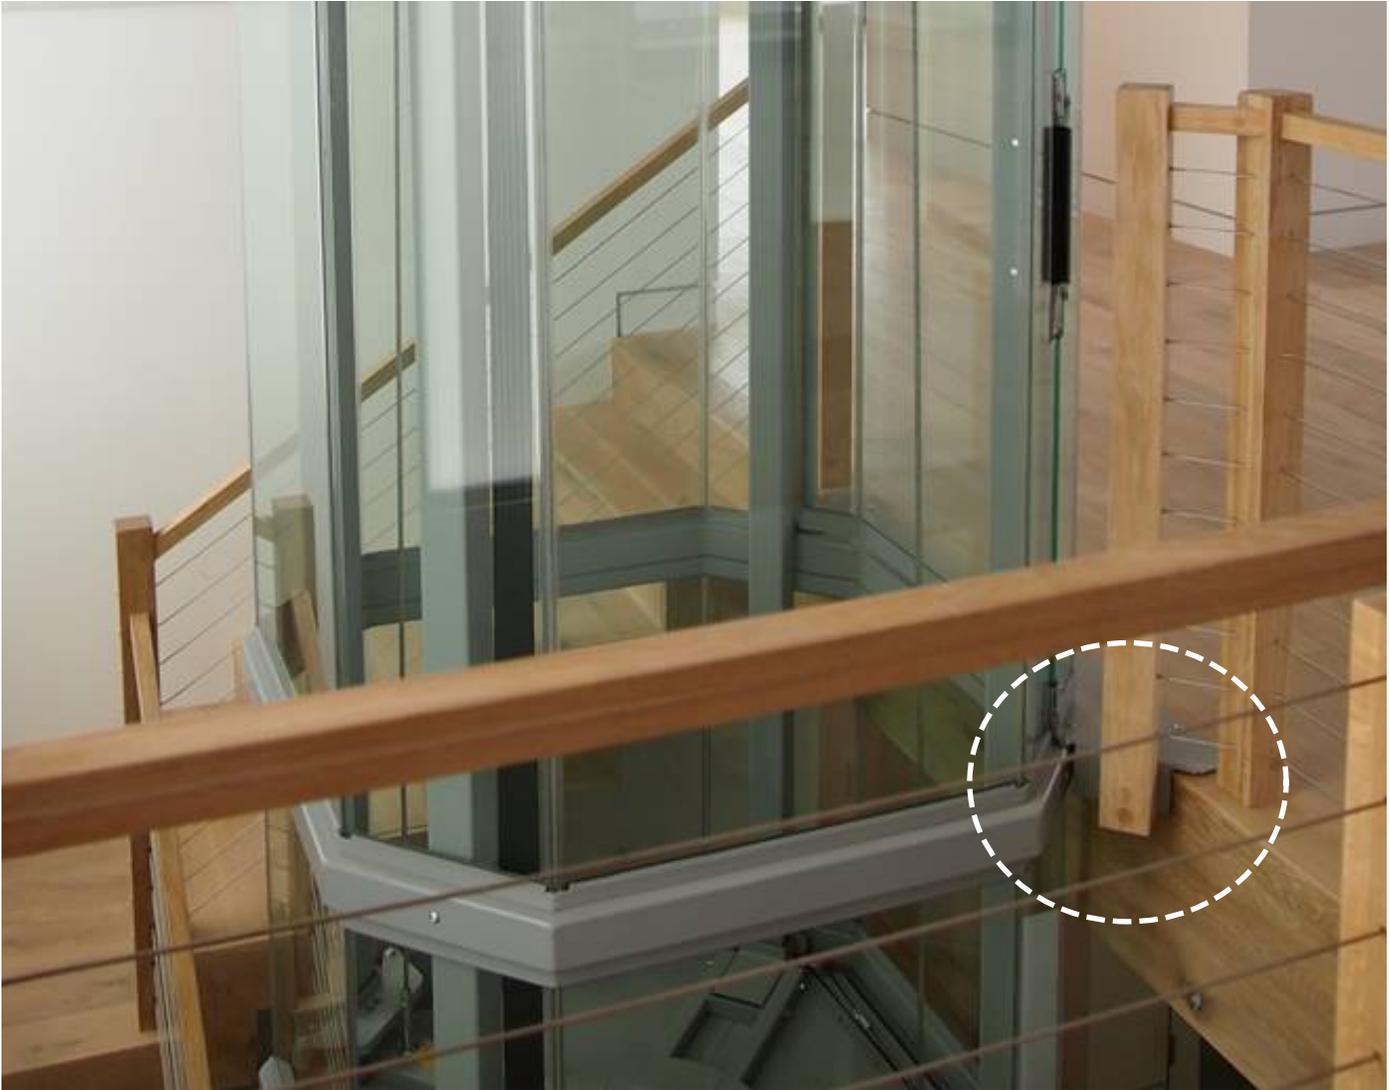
Balcony plate and handrail information - octagonal glass (OGM) type 1 shown
